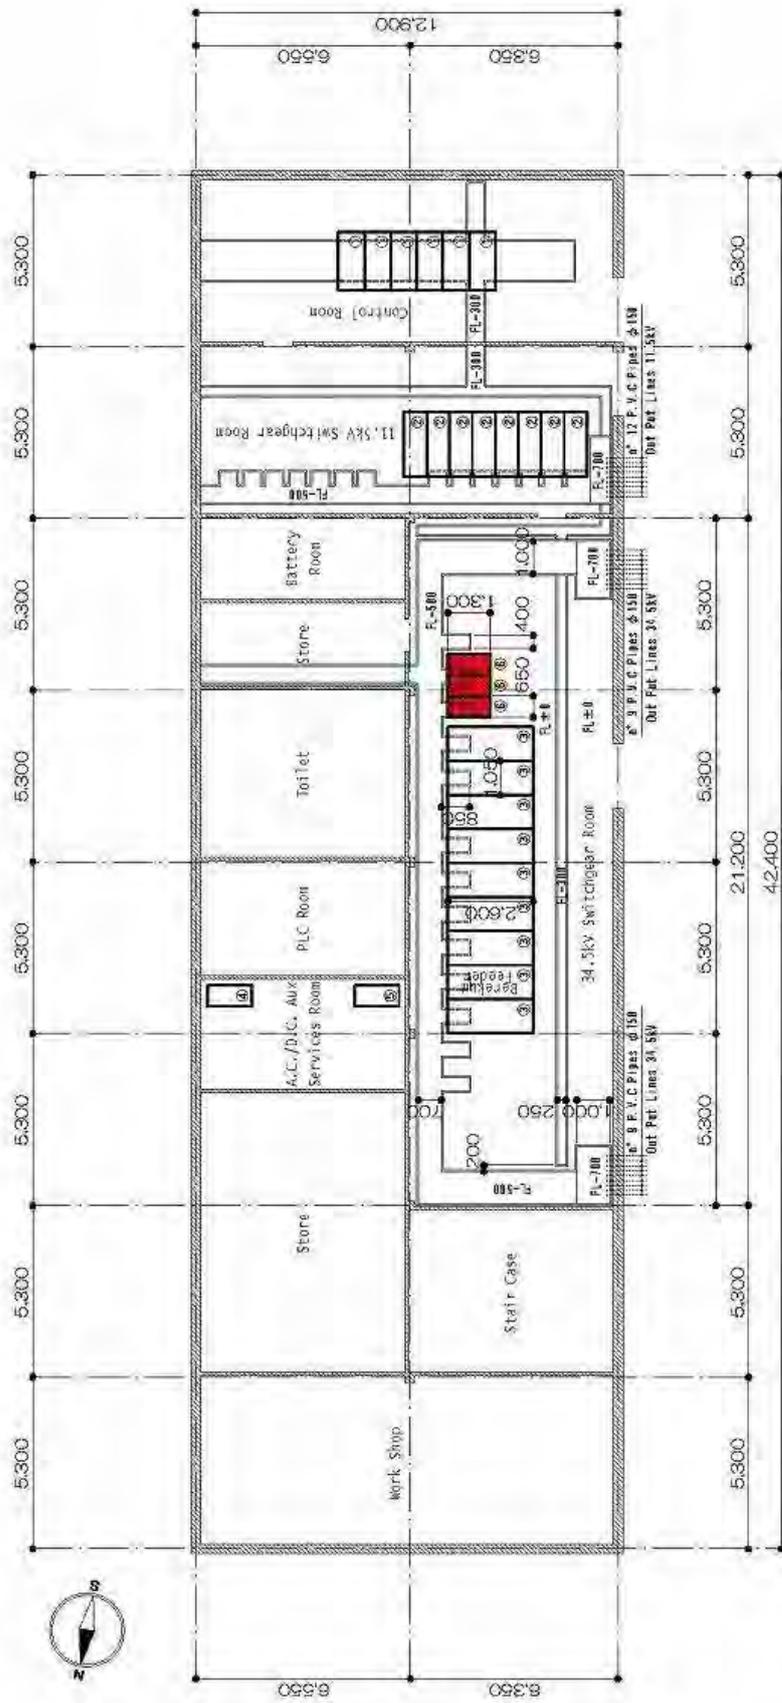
Sectional Plan of Kotokrom Primary Substation
